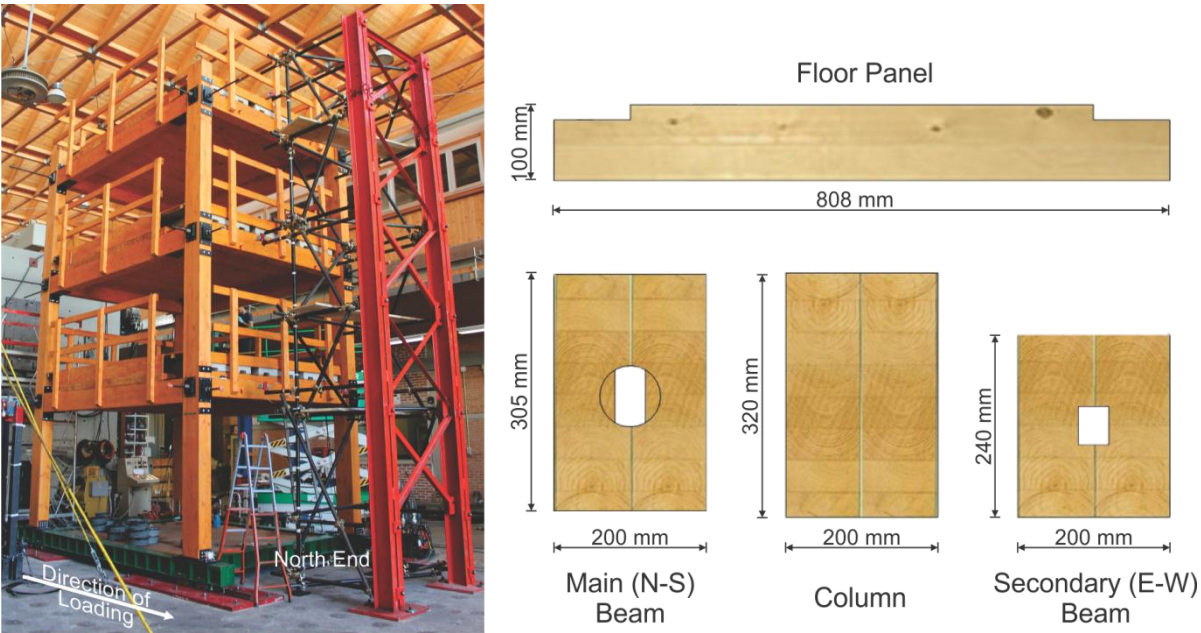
Test set-up for 2/3rd scaled, 3-storey dynamic frame specimen
